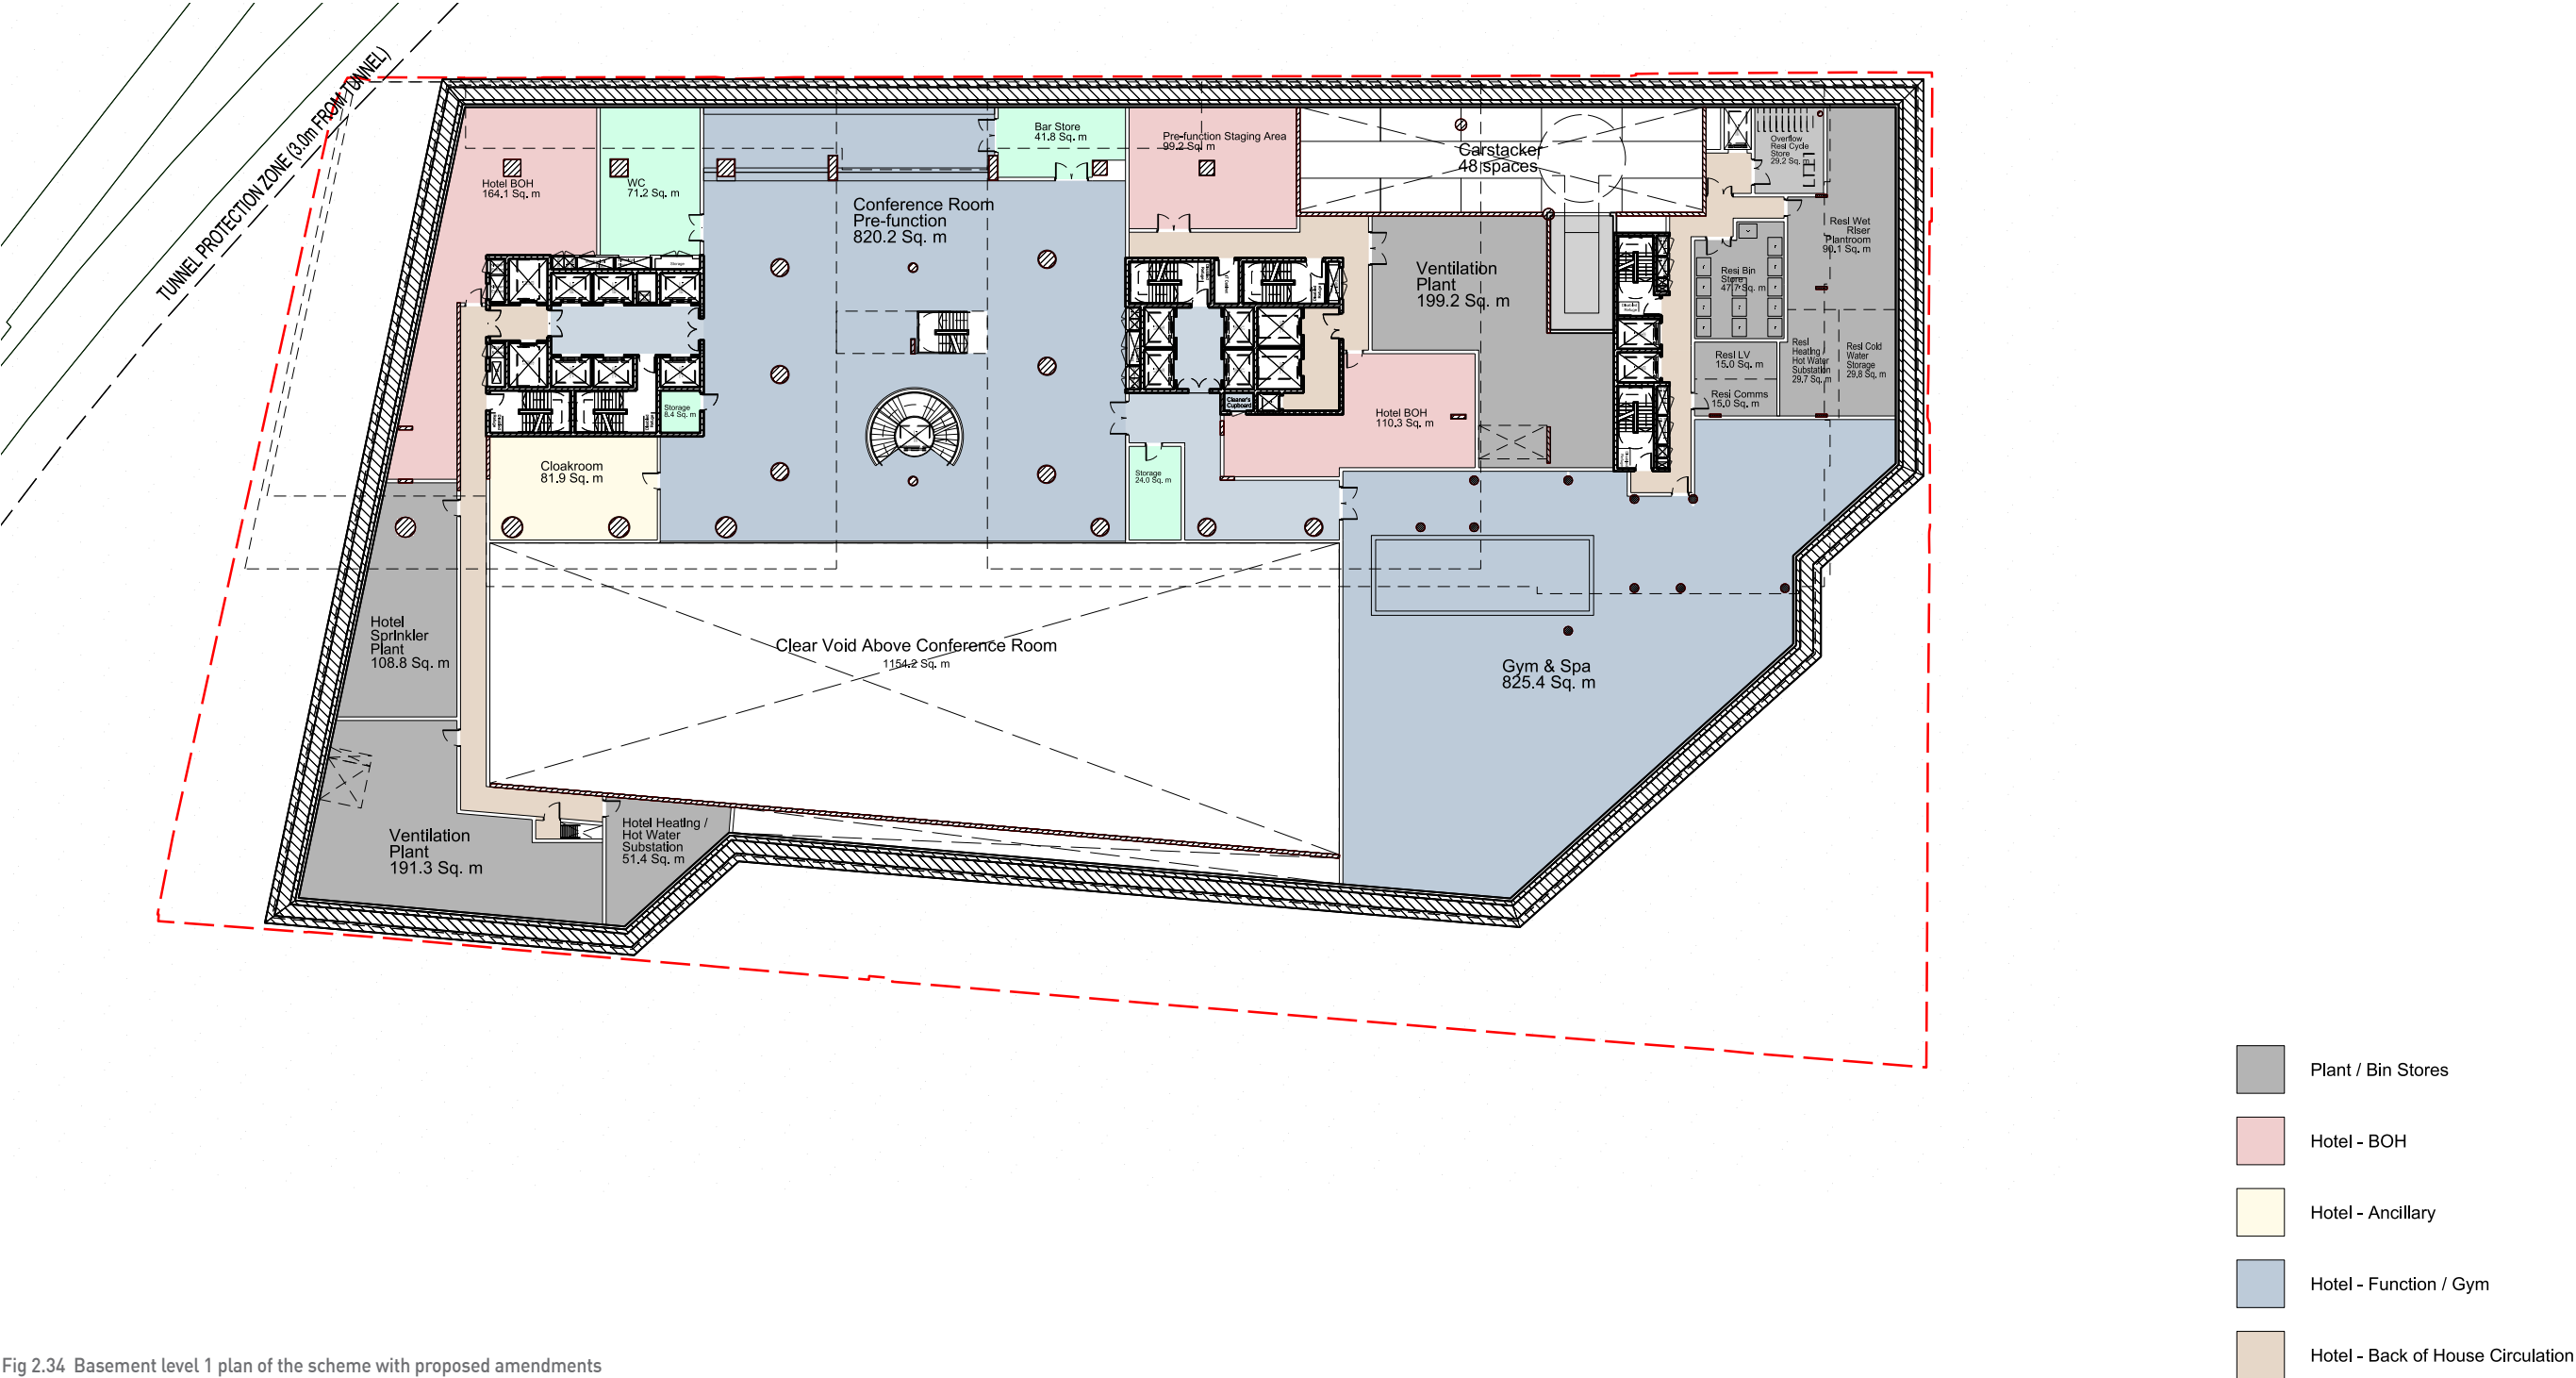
Basement level 1 plan of the scheme with proposed amendments
